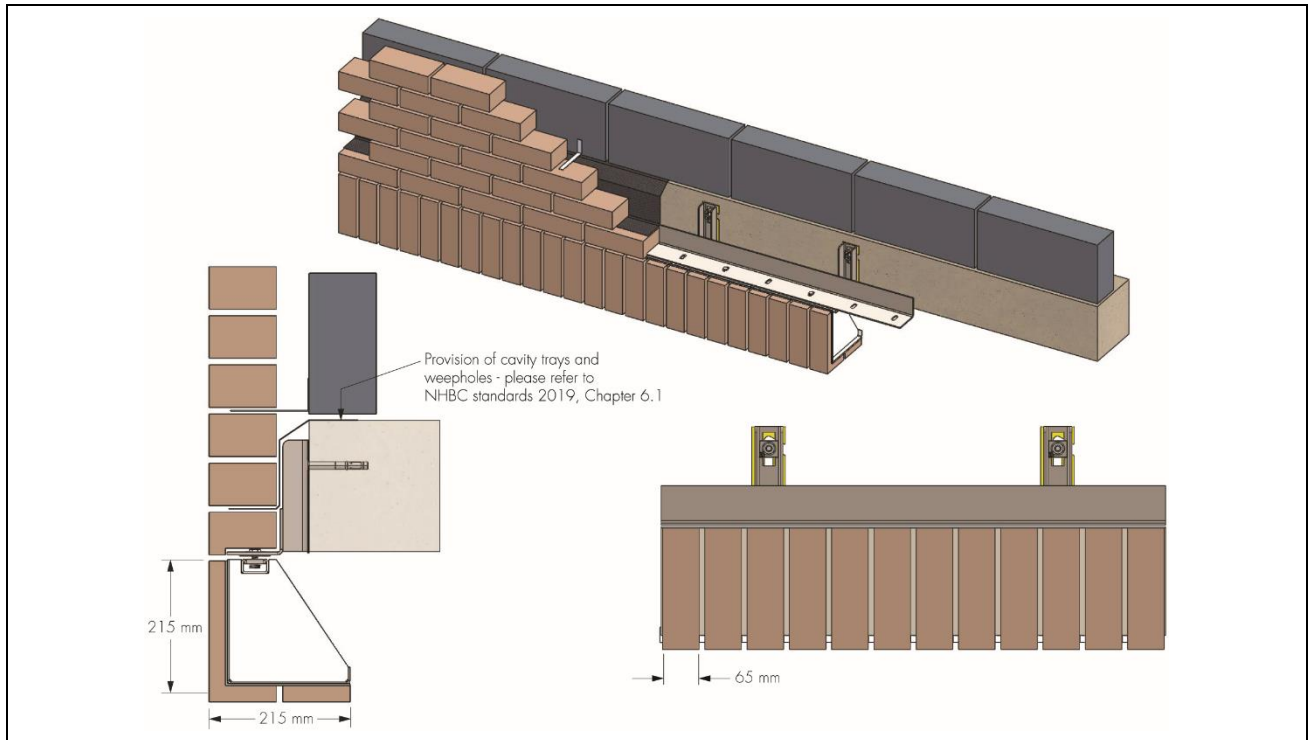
BOSS 65 x 327 mm with stretcher bond (welded masonry support, shims and anchor bolts are outside the scope of this Certificate)
